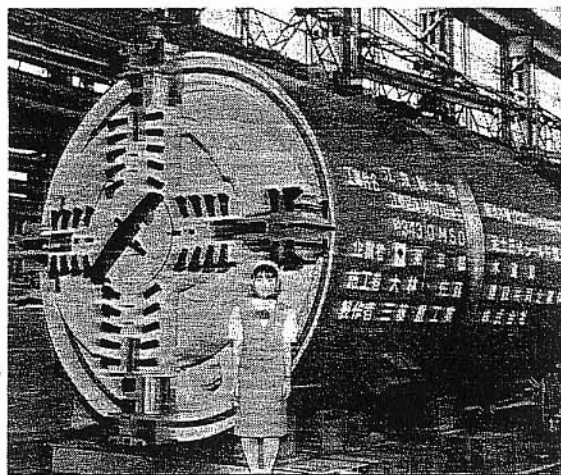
Penetrating side machine (Obayashi Corporation JV)
